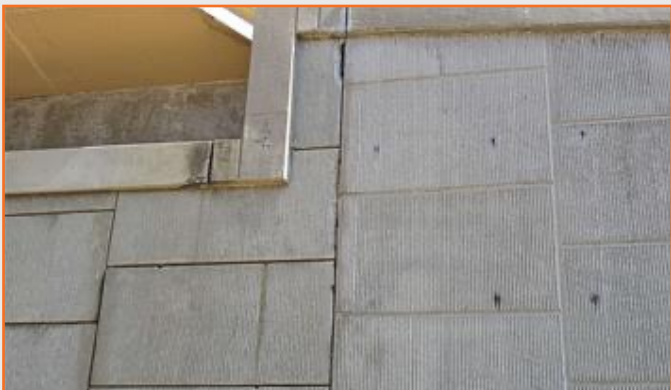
PGBT retaining wall spalls NBML at Las Colinas Blvd.
